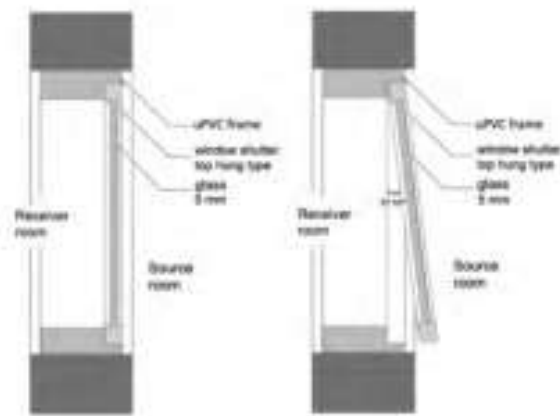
Section showing the degree of openings of the window shutter; 0° (a) and 5° and 10° (b).
